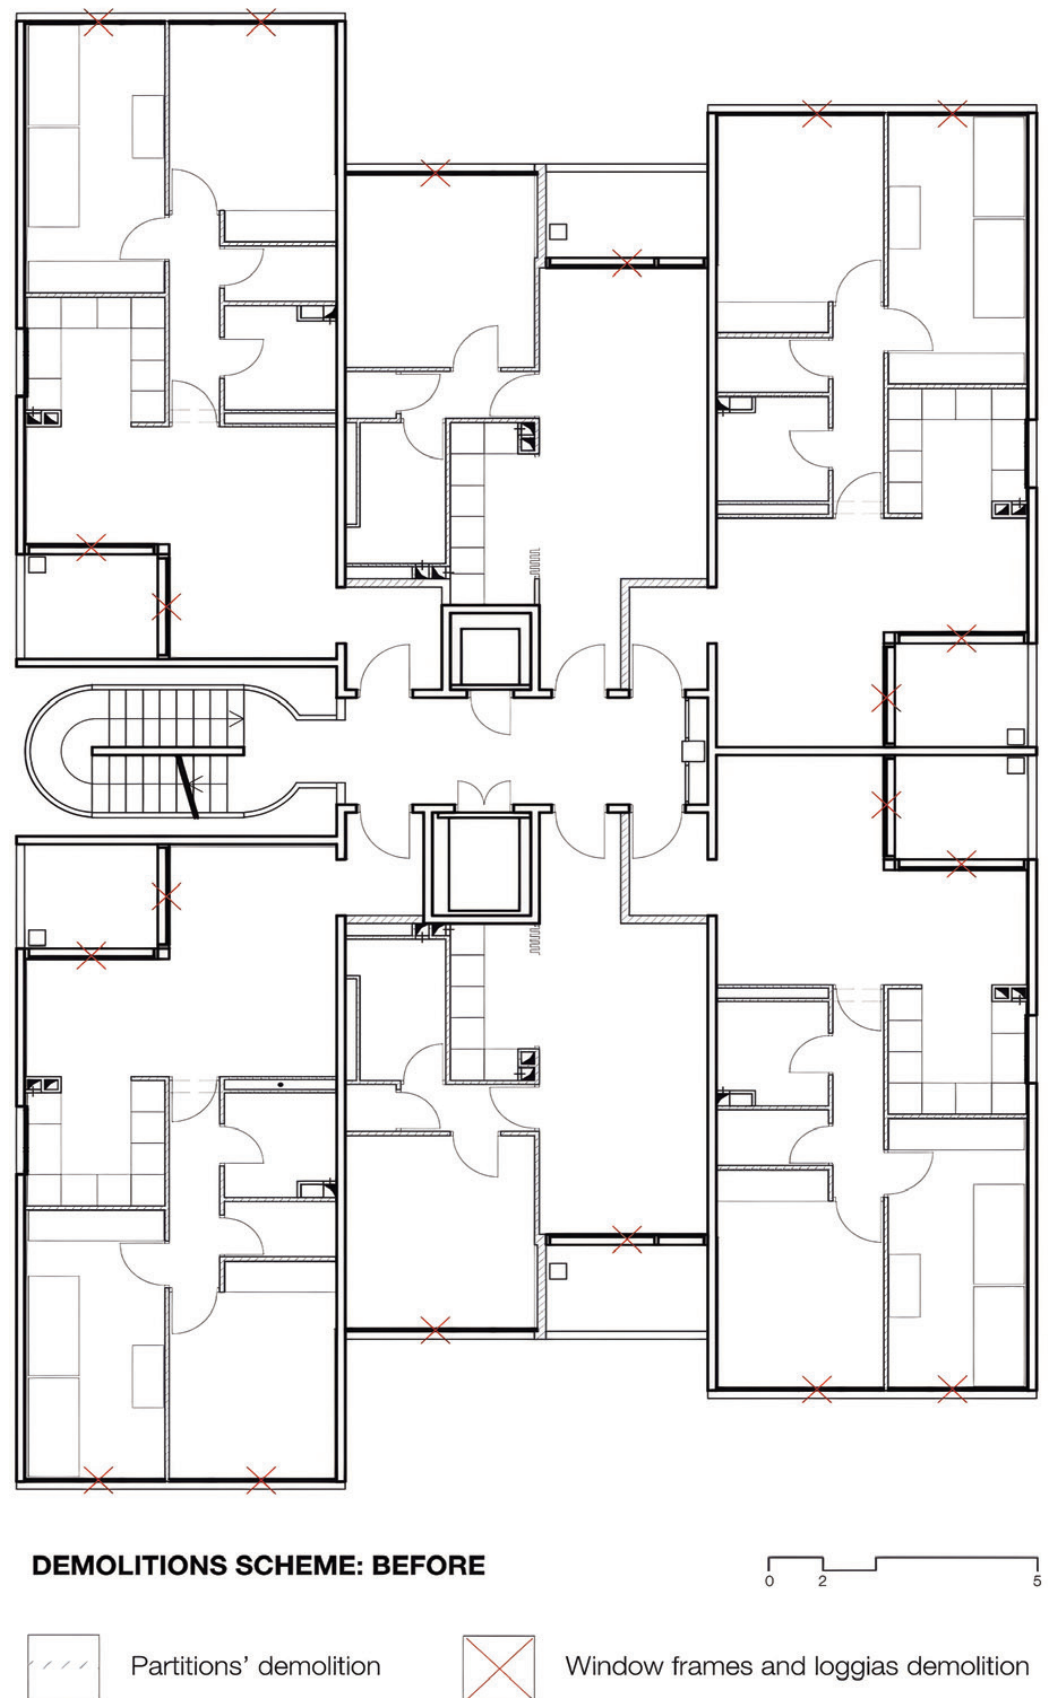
| Torrevicchia (Rome): existing condition; typical floor plan of the building selected for the experimental application, with structural interventions highlighted (credit: C. Vannini, 2025).
